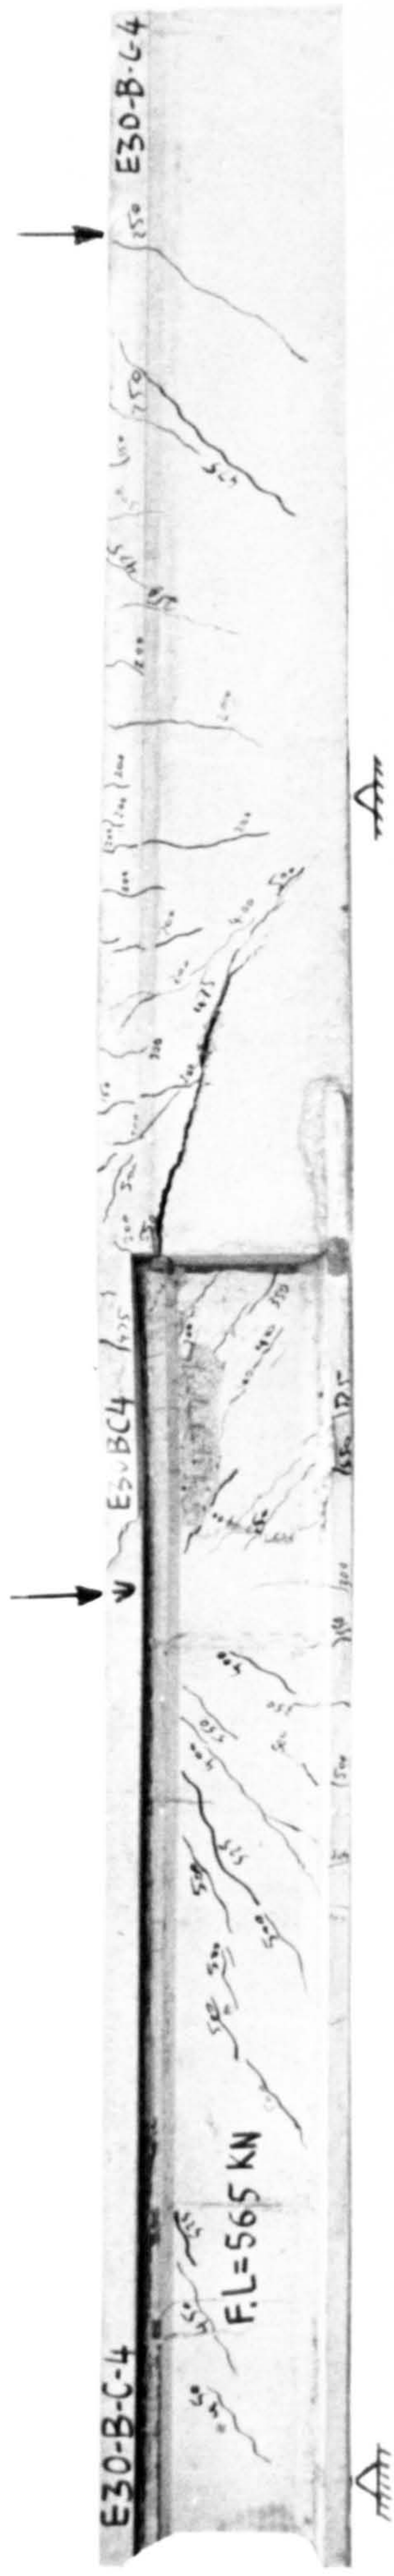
Longitudinal Elevation of Beam E30BC4 After Failure
